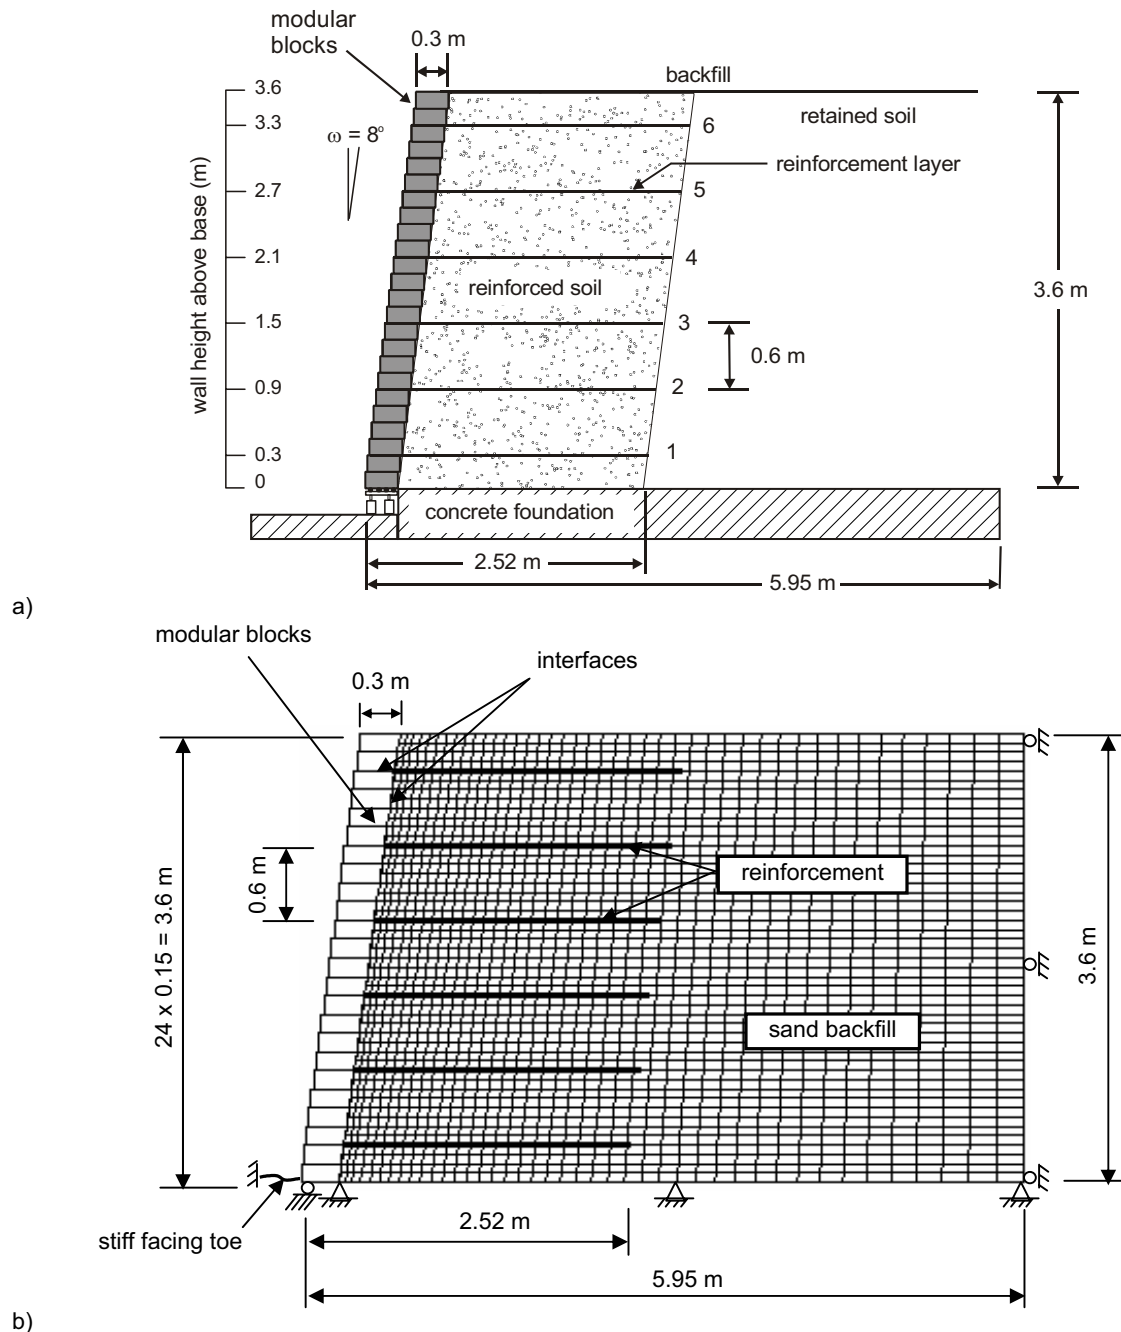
Cross-section view of Wall 1 (control structure) with six layers of reinforcement: (a) Schematic view of basic components; (b) FLAC numerical model
